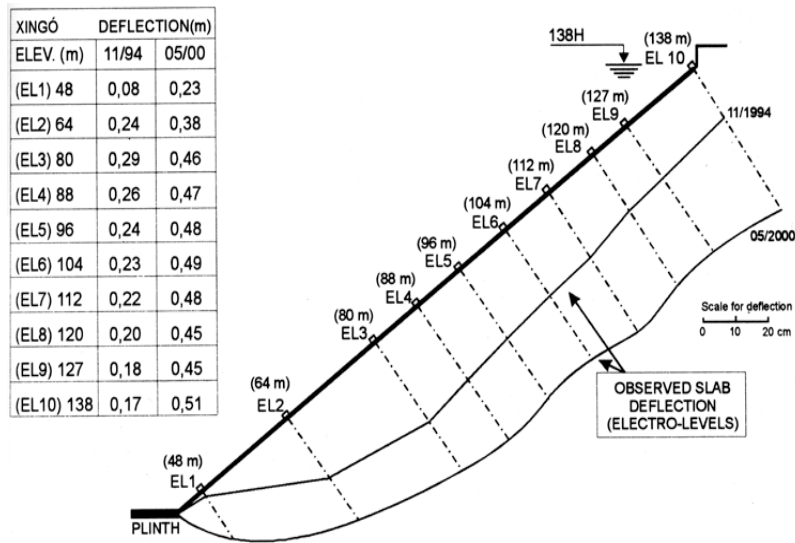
Calculated slab deflection. Short and long term behaviour – Xingo Dam
